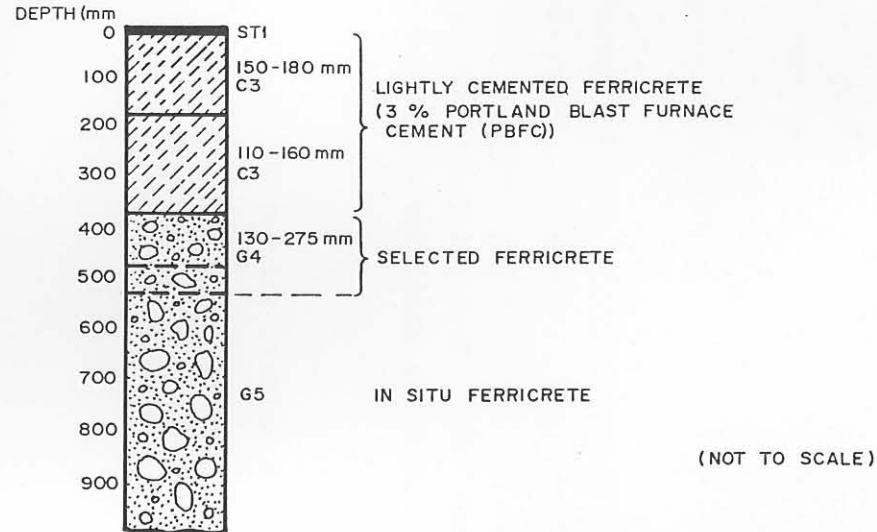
(b) DETAIL OF THE RELATIVELY DEEP PAVEMENT STRUCTURE AT THE HVS SITE (km 2,9) ON ROAD 1932, NEAR ROOIWAL
